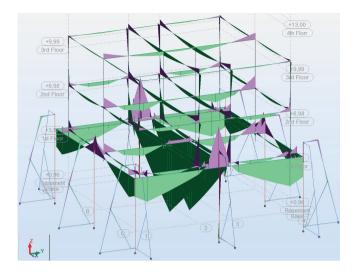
Overview of the Pilot Building structural modelling, M_v diagrams
